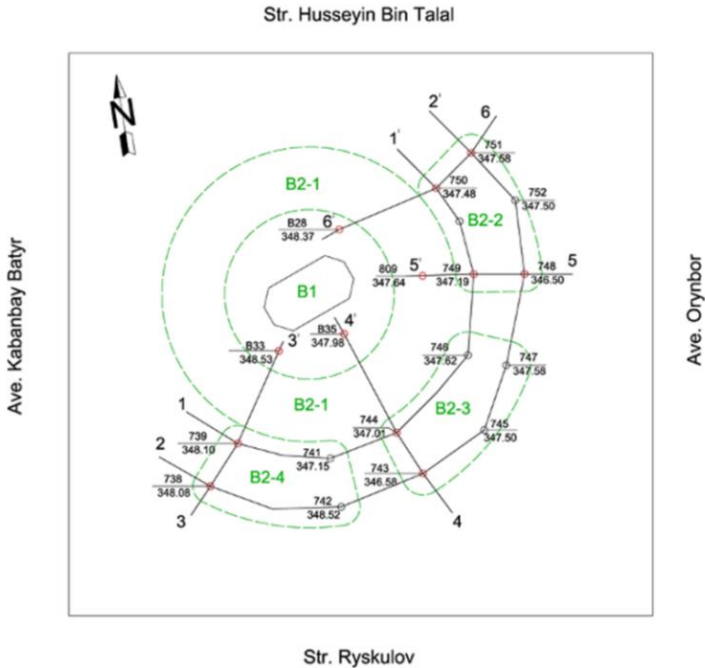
Plan location of boreholes on construction site of EXPO-2017
